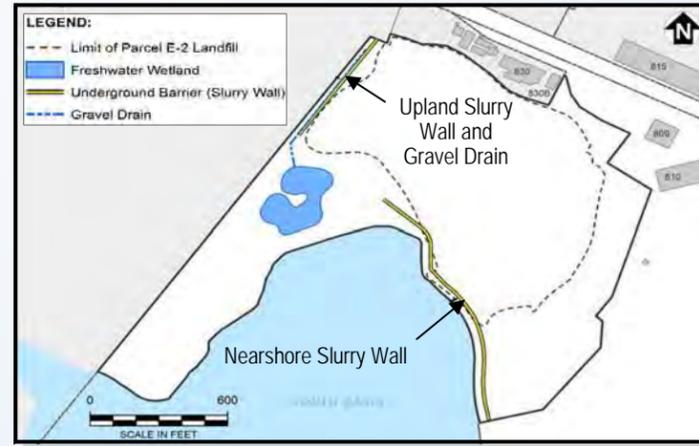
Locations of Underground Slurry Walls at Parcel E-2
